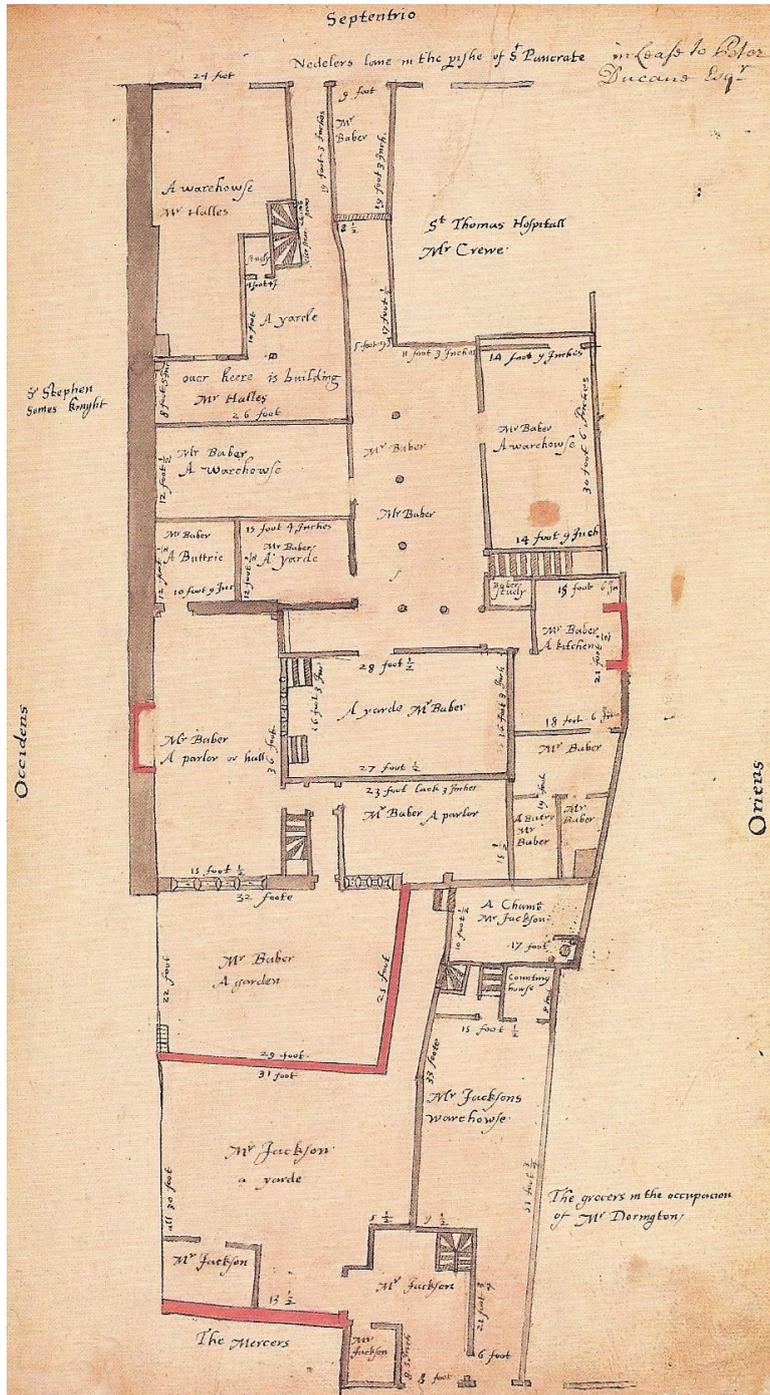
The ground floor plan of 3-4 St. Pancras Lane.
